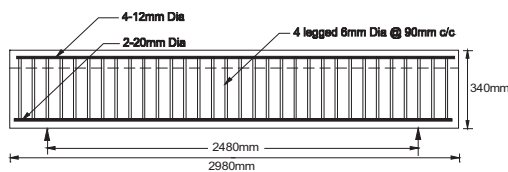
Internal reinforcement details of RC beams in categories TT1, TS1, TT2, and TS2
